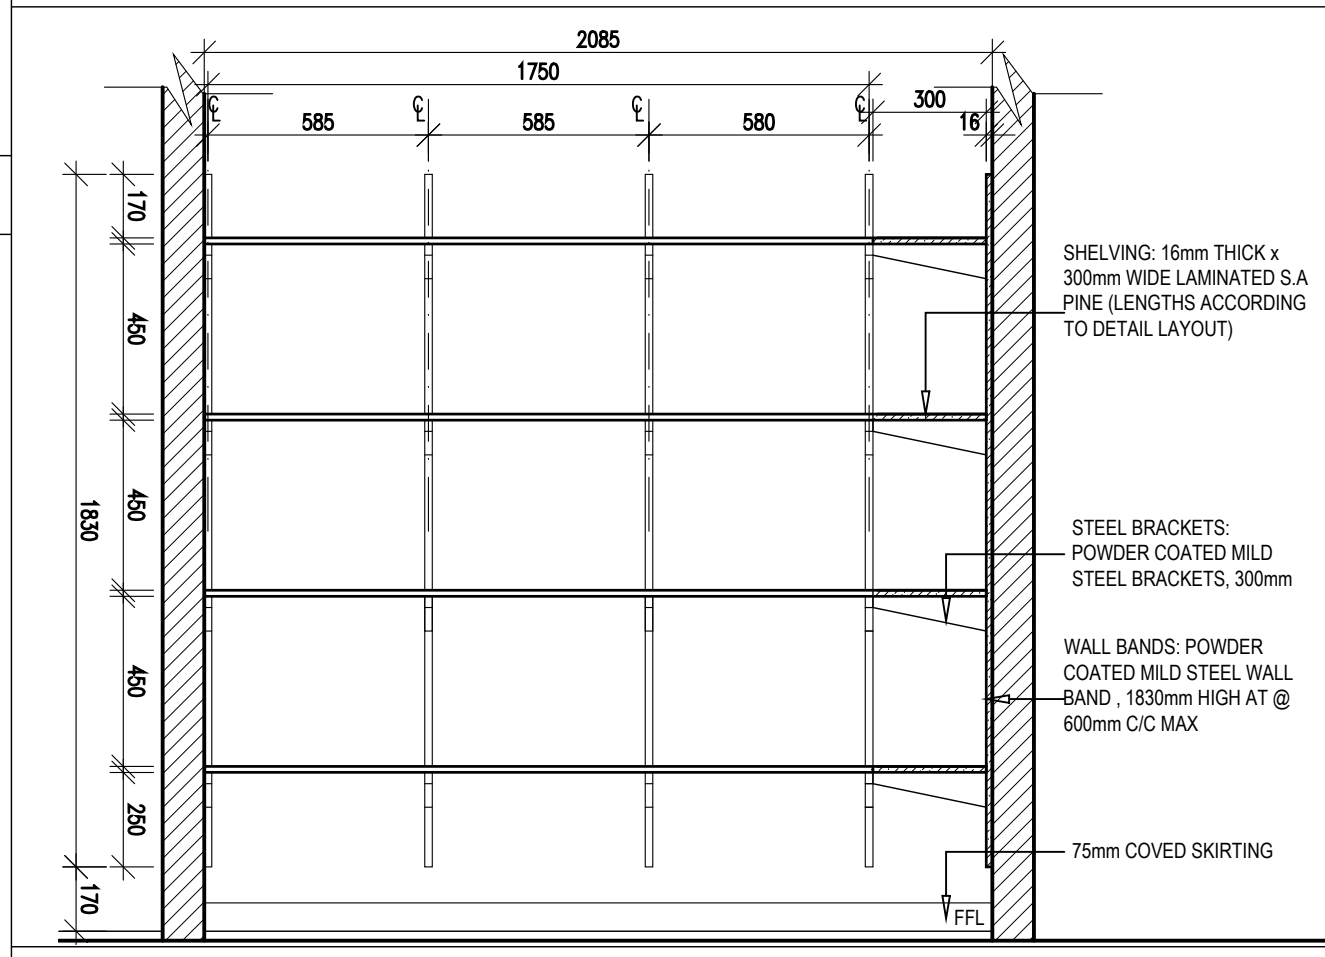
SECTIONAL ELEVATION C SCALE 1:20
